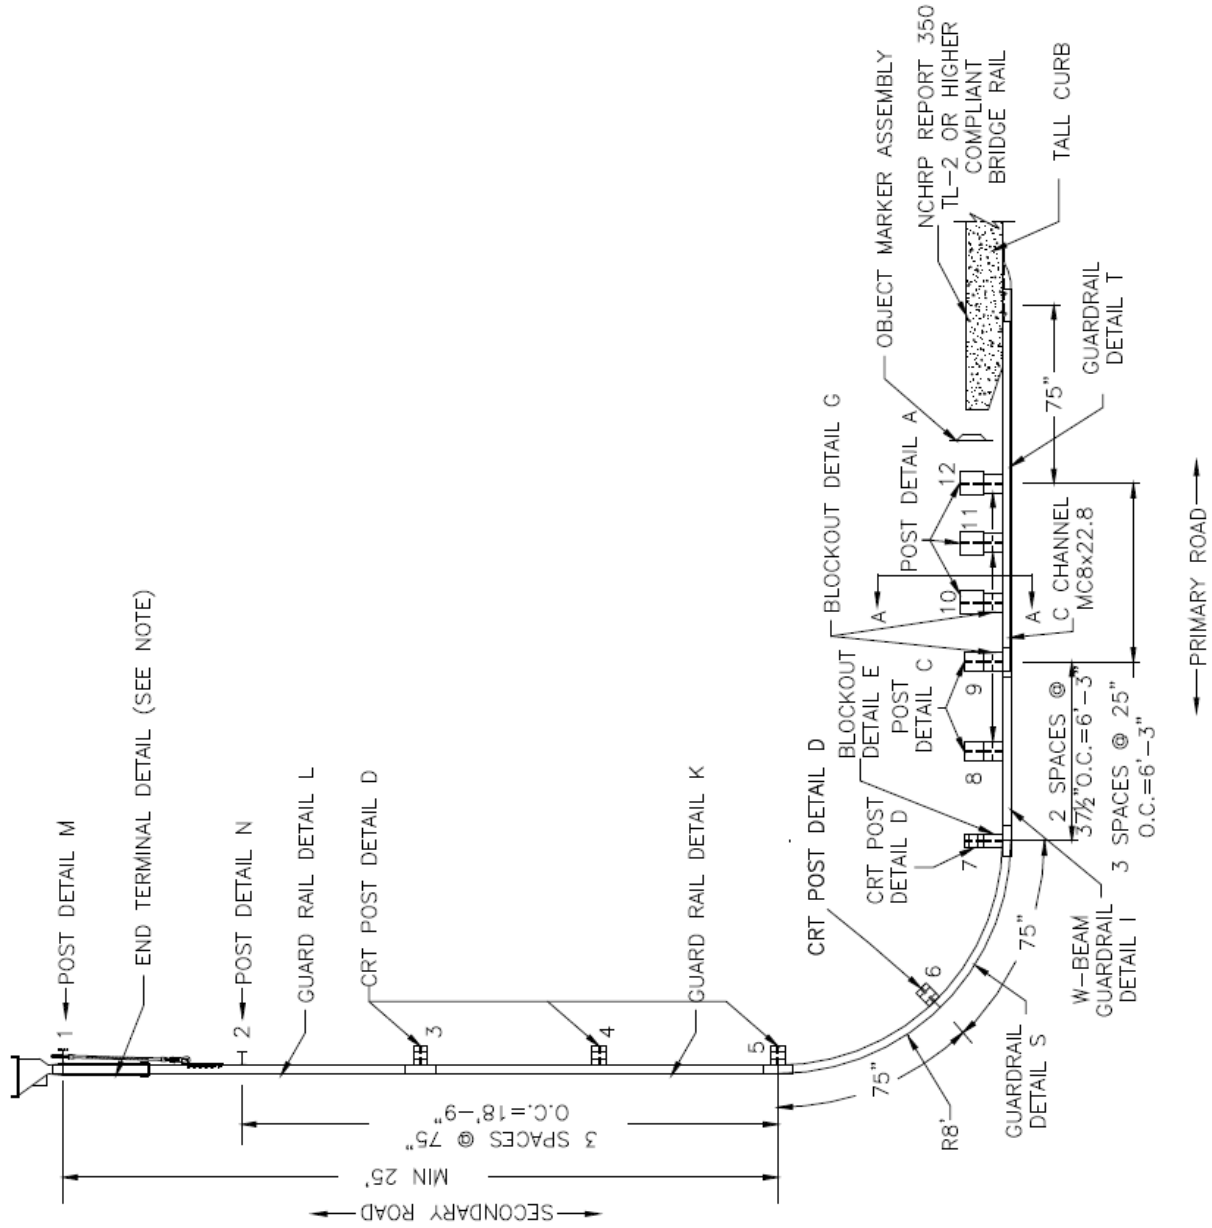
Recommended Short-Radius Guardrail System, TTI NCHRP Report No. 350 TL-2 System [26]
